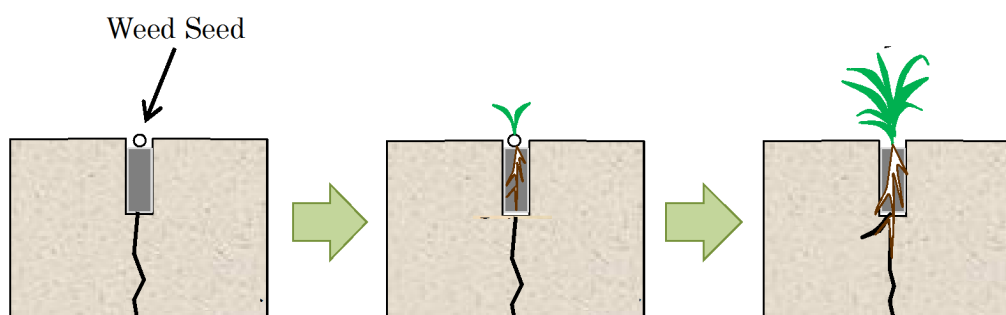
Theoretical invasion process of weeds into concrete pavement joint
